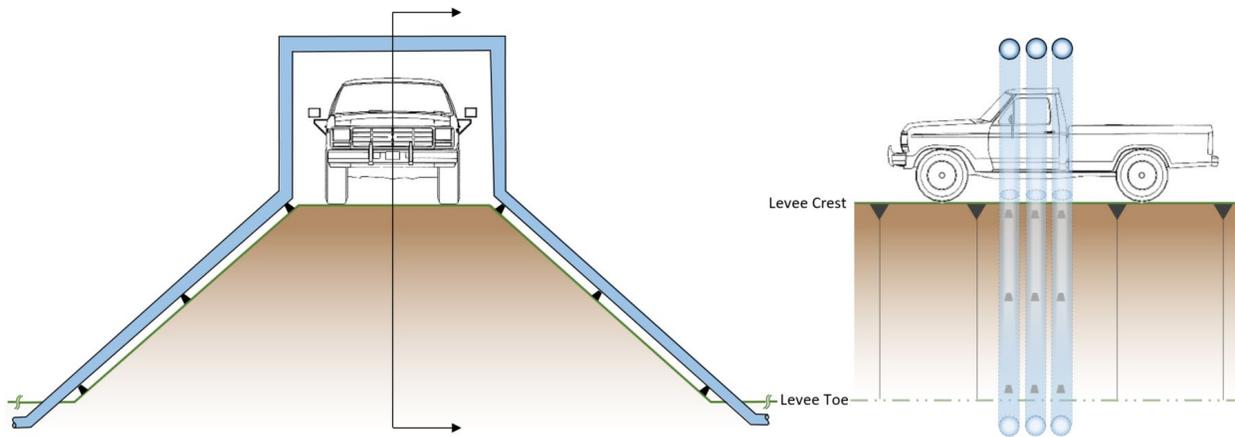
Elevated pipes providing vehicular passage (pipe support and protection structures removed for clarity).
